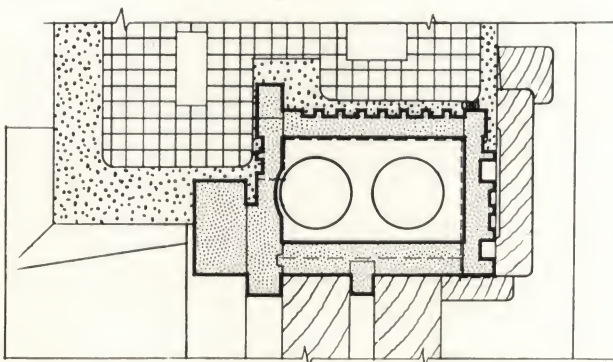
Box frame No. 671 showing 8" tile with special jamb block and plaster on tile. Note position of anchor strip to give narrower jamb width.
